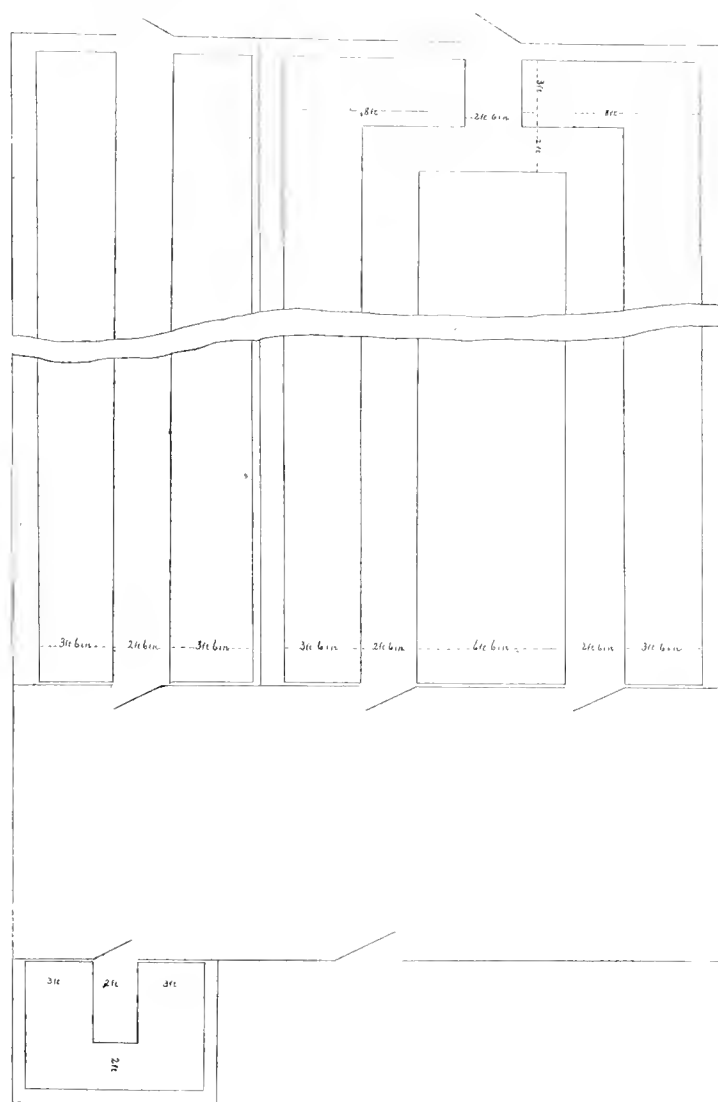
GROUND PLAN OF SMALL GREENHOUSE.
